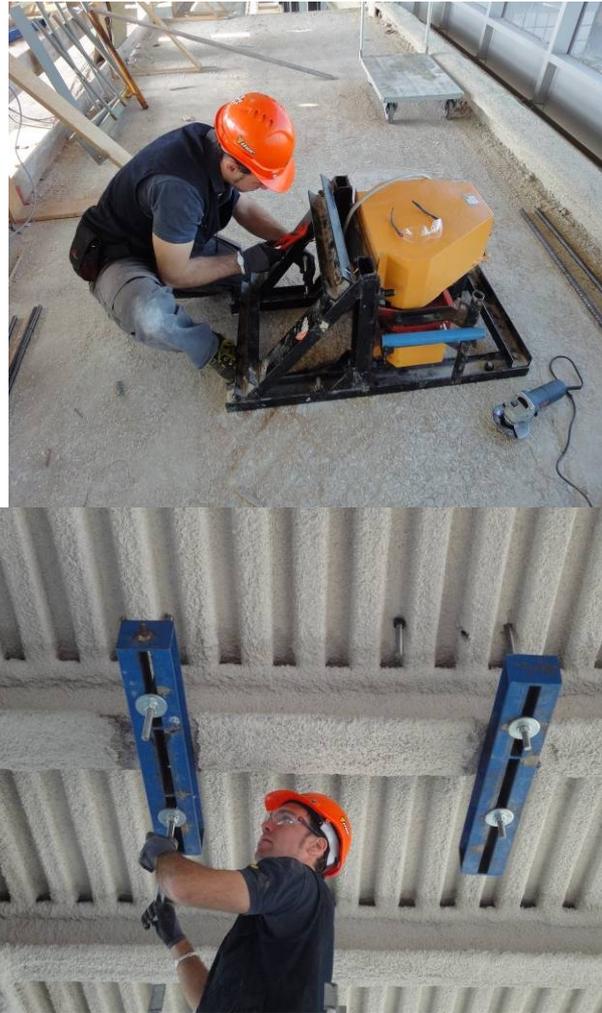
Vibrodyne installed inside the tunnel and connection detail
